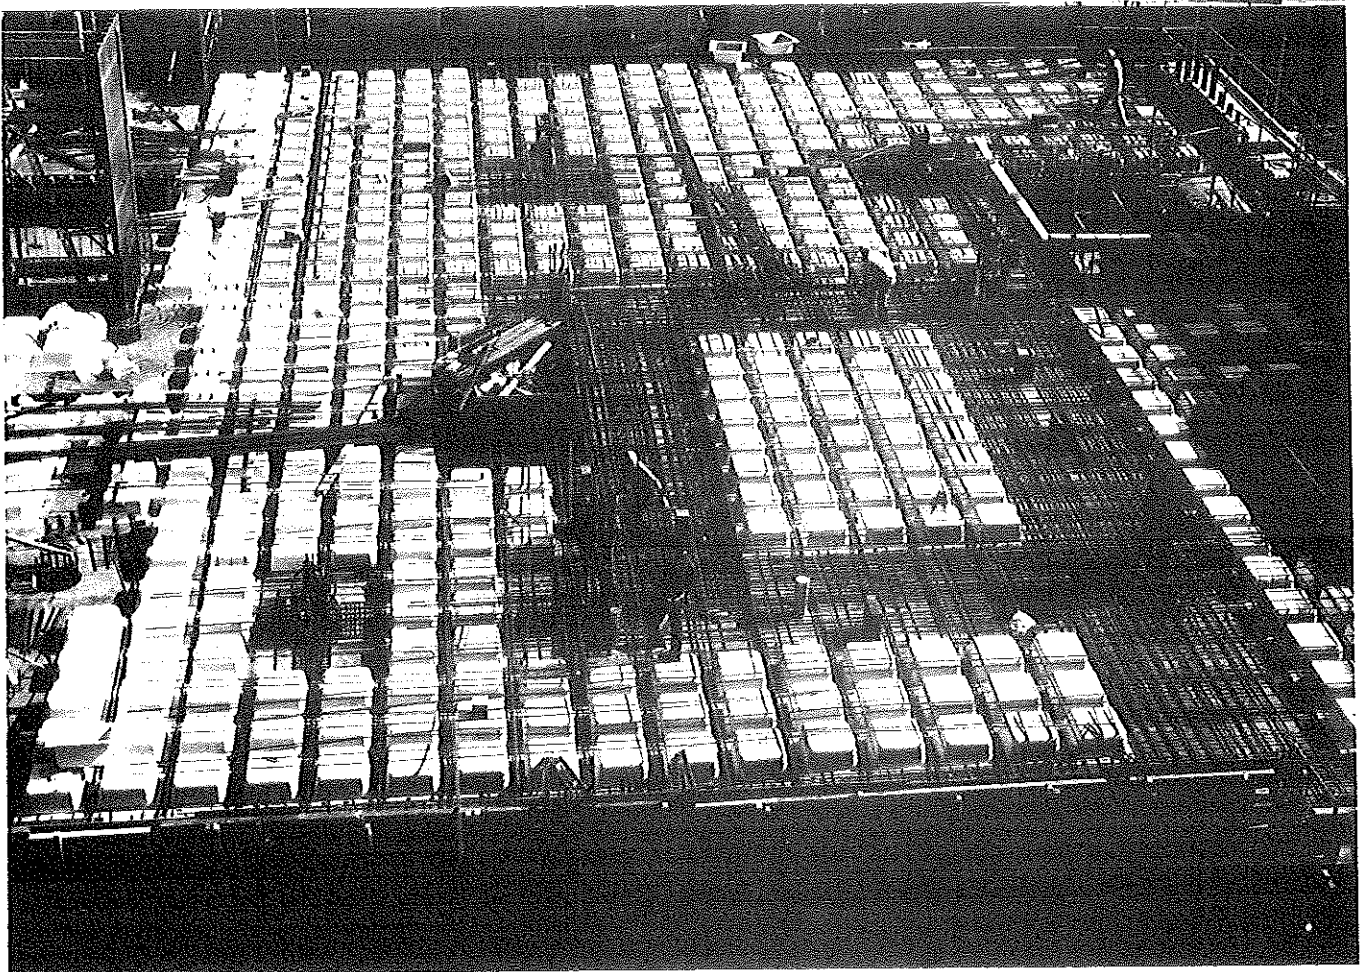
Waffle pan formwork and steel reinforcement.
